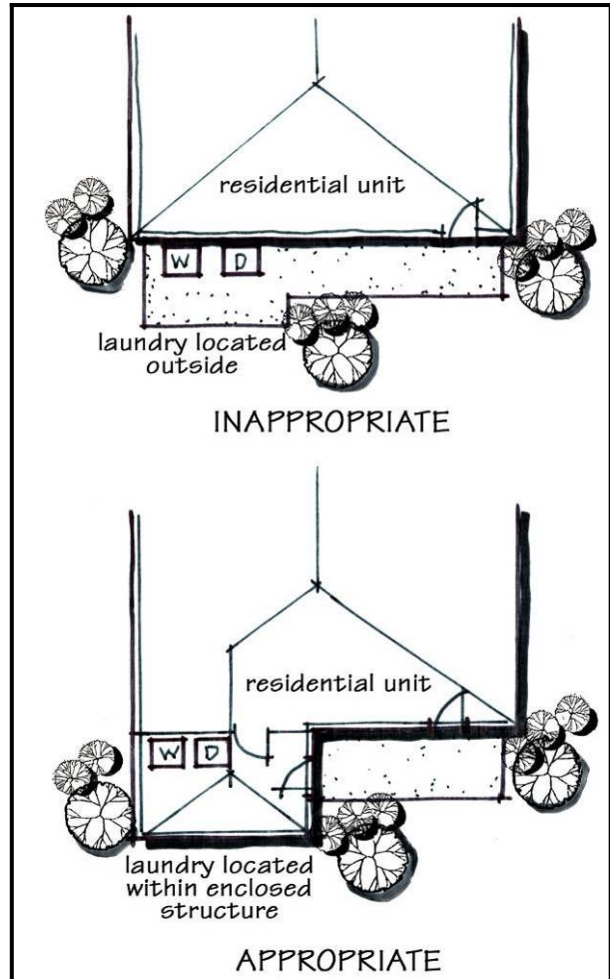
Laundry facilities should be fully enclosed and provide direct access from the interior of a structure
